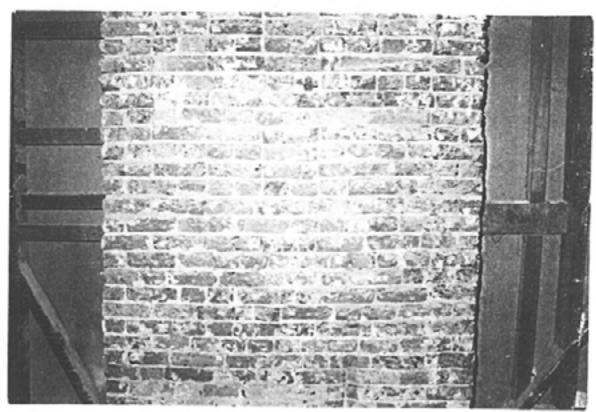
Waitangi Treaty House skillion interior showing the 1833 Parrametta brick chimney.
